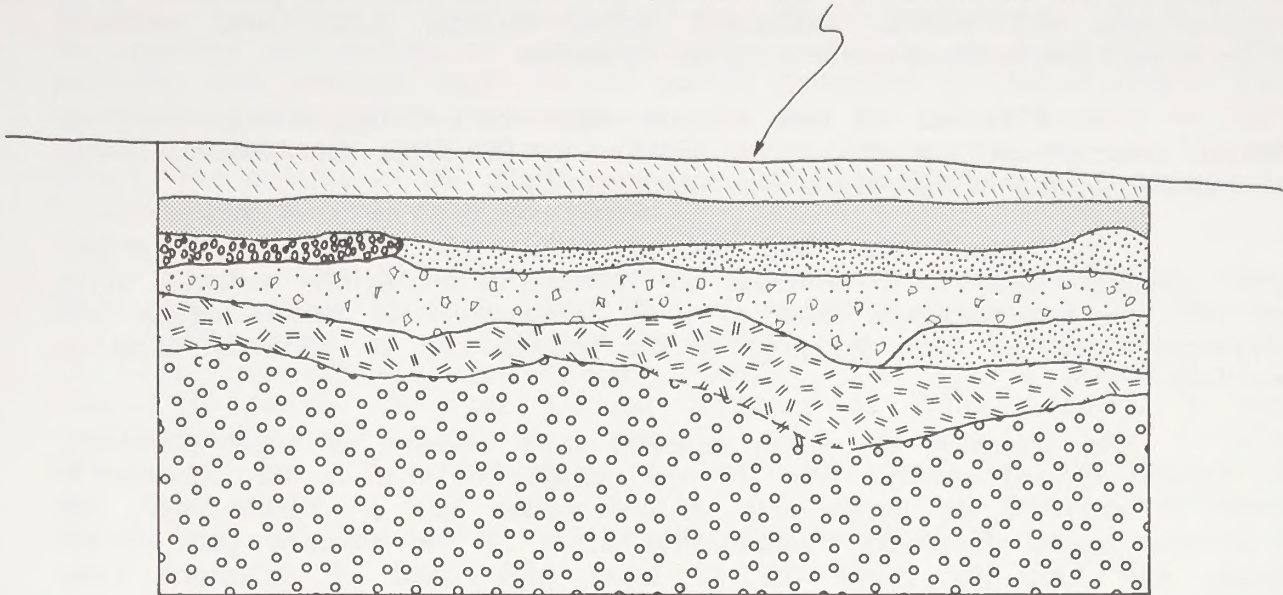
Riv-3798: CROSS SECTION OF RAILROAD CUT
